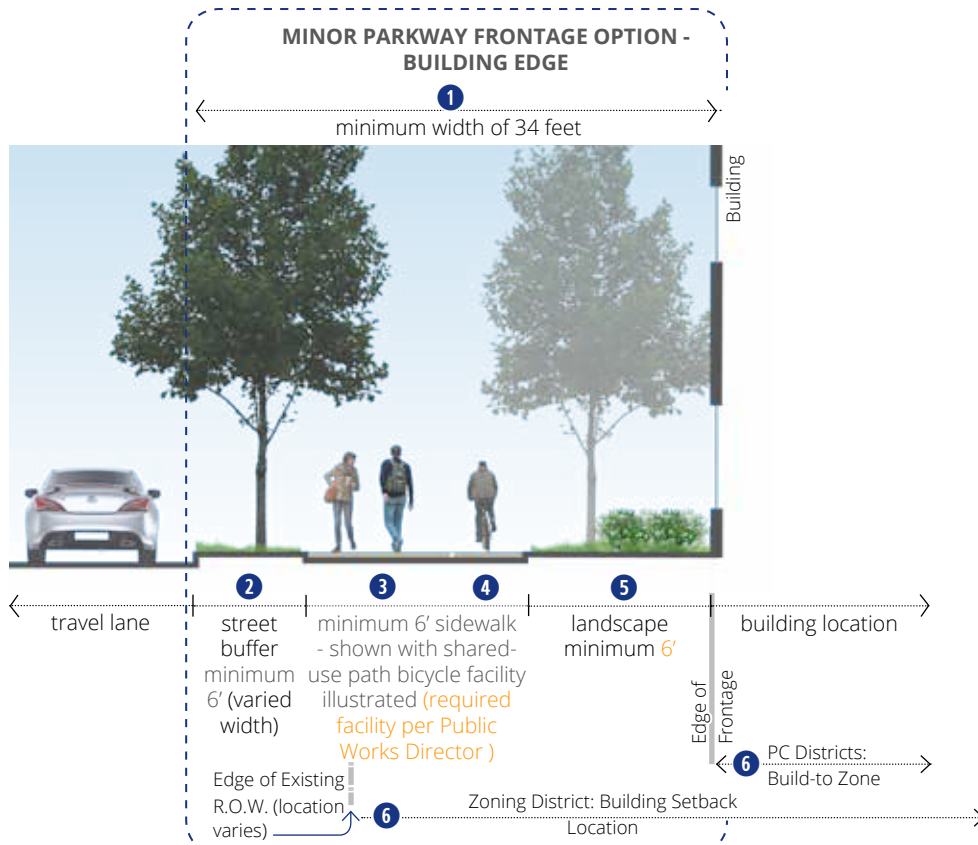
Minor Parkway Frontage Option - Building Edge
